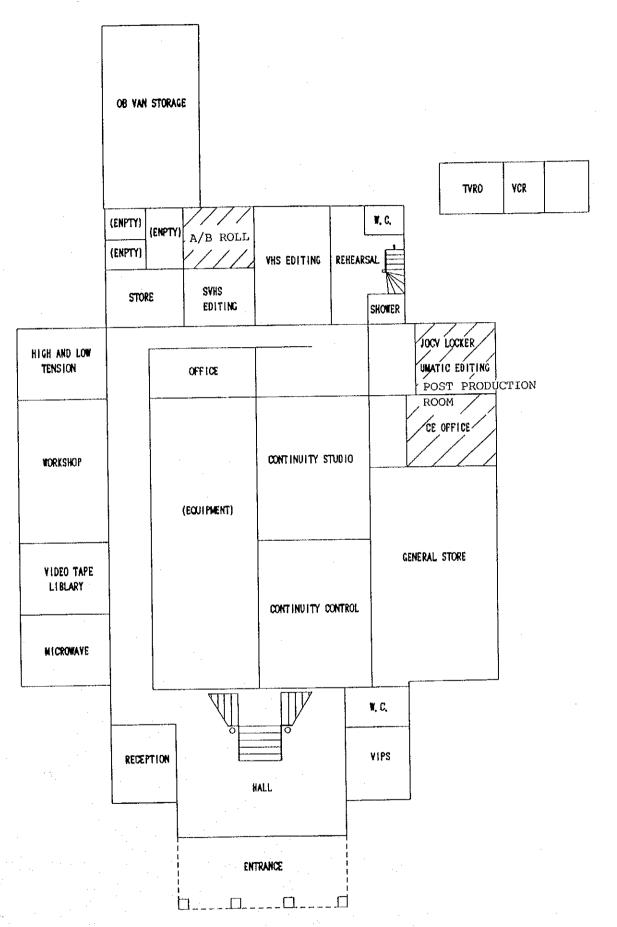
FLOOR LAYOUT OF KARUME HOUSE (GF)
